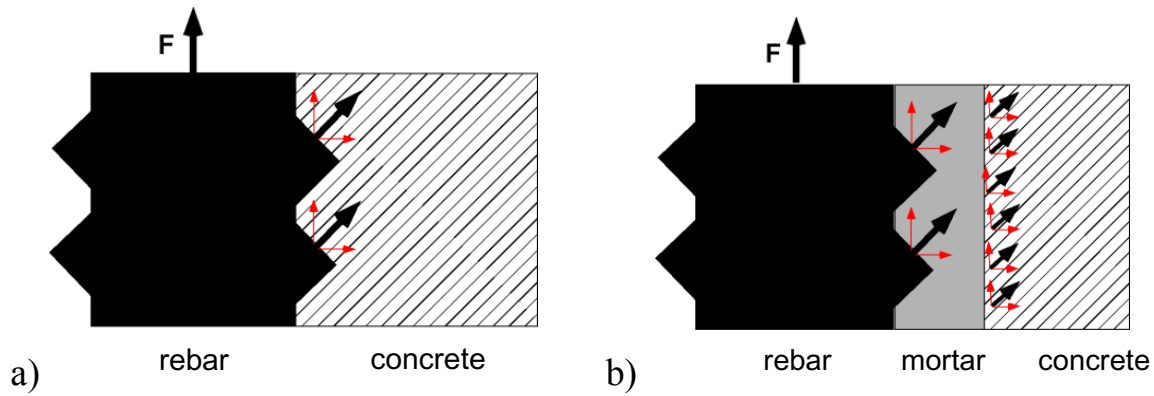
Load transfer via a) cast-in rebars and b) post-installed rebars, [16]
